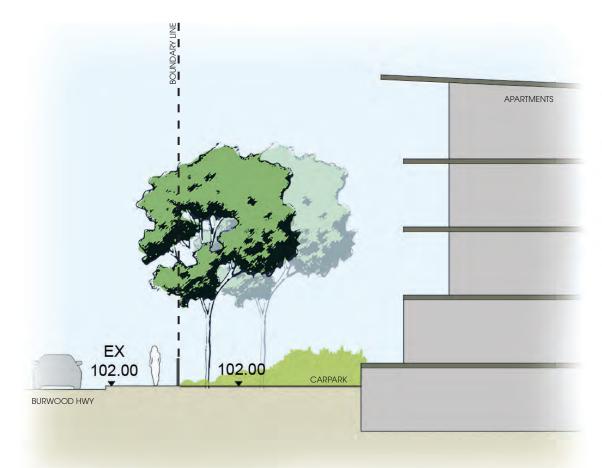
ROAD EDGE SECTION KK (ILLUSTRATIVE ONLY)
